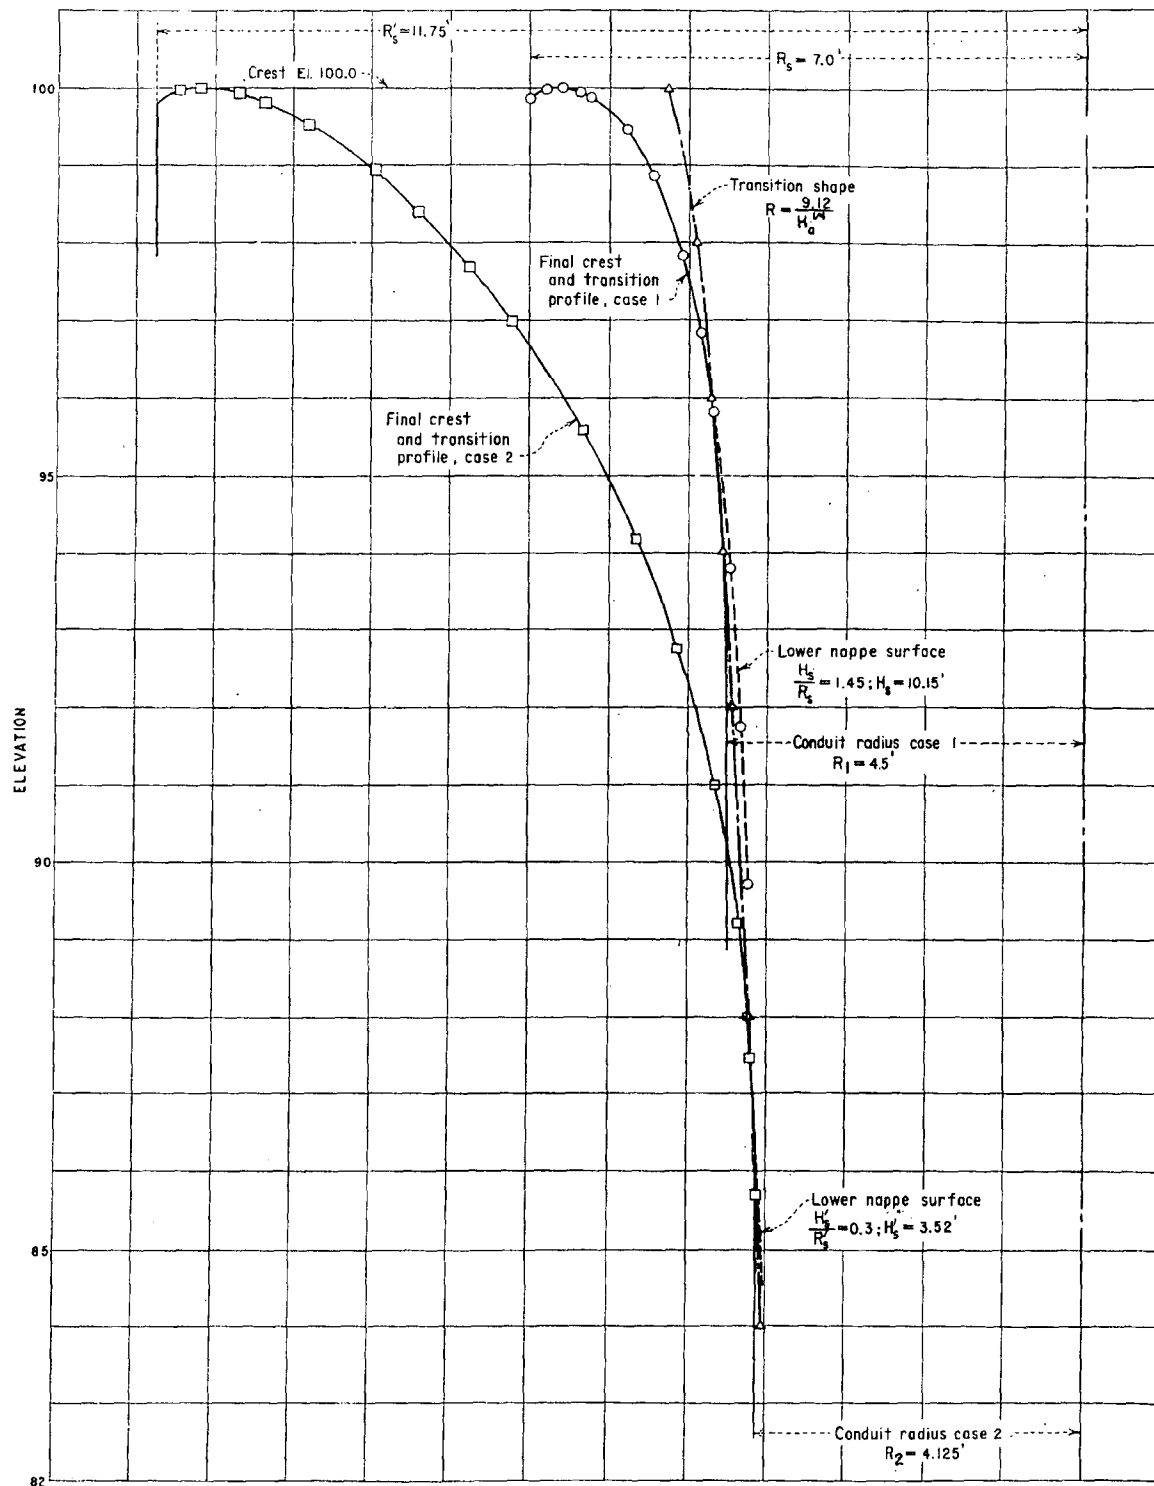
Drop inlet crest, transition, and conduit plottings. For design example in section 9.26(f). 288-D-2515.
